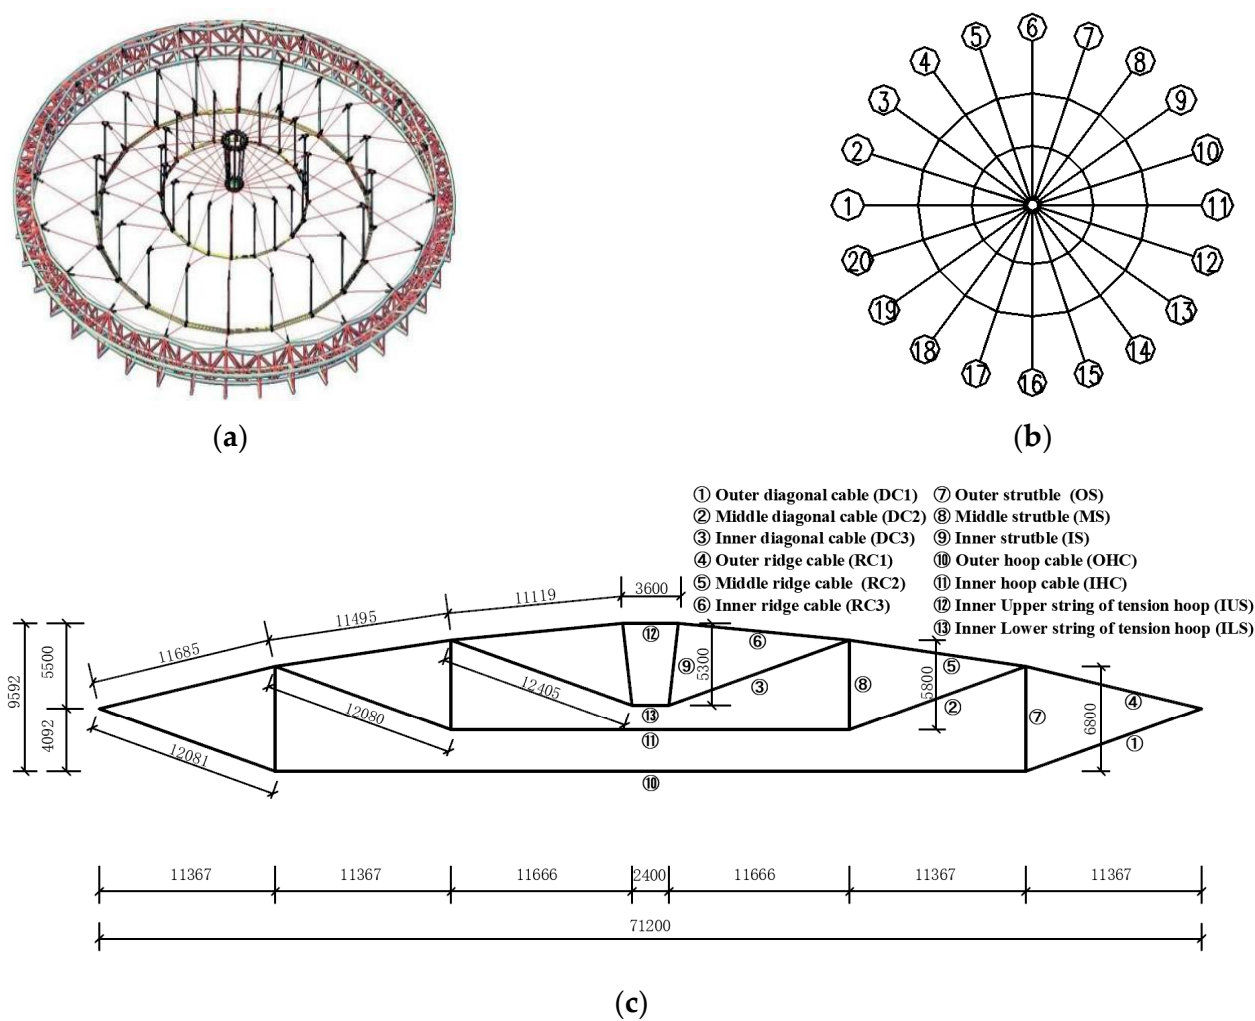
Cable dome structure. (a) Structure model, (b) structure units, (c) elements and sizes (mm).
